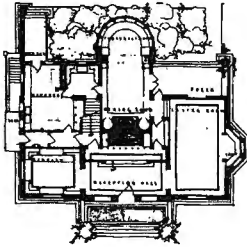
F.L.I.Wright. Winslow House, 1893. Ground floor plan.
